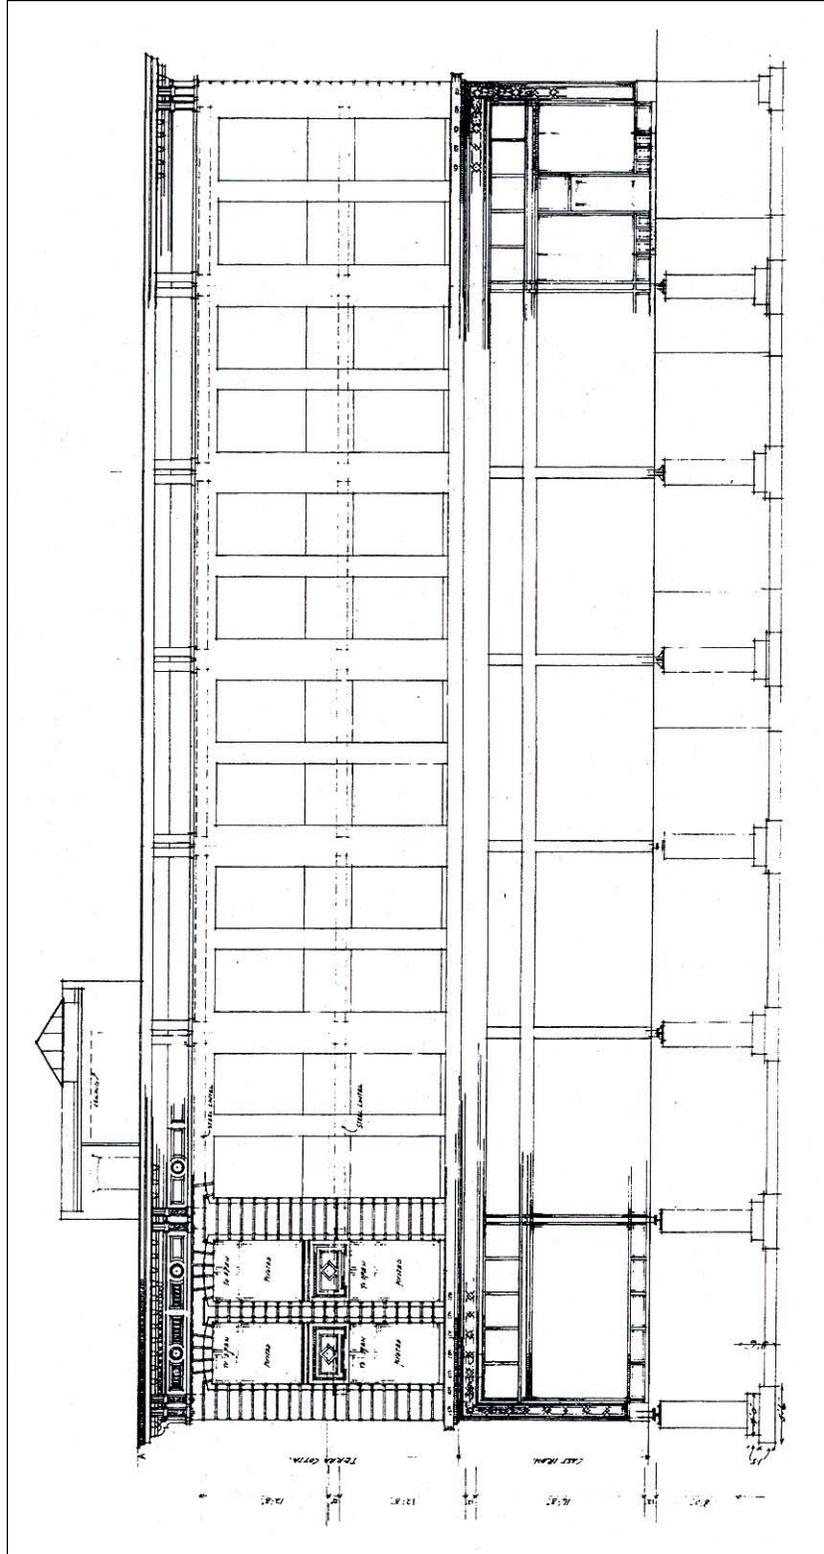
Architect’s plans, “Elevation to Carlton Street,” 1912. (Courtesy of City Archives, [Plan #1399/1912.](#))
